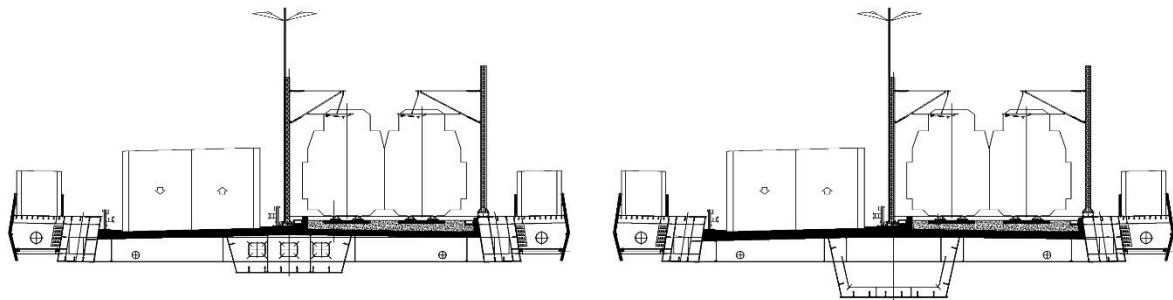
Cross-sections of the approach bridge structures 1-2 and 4-5.
